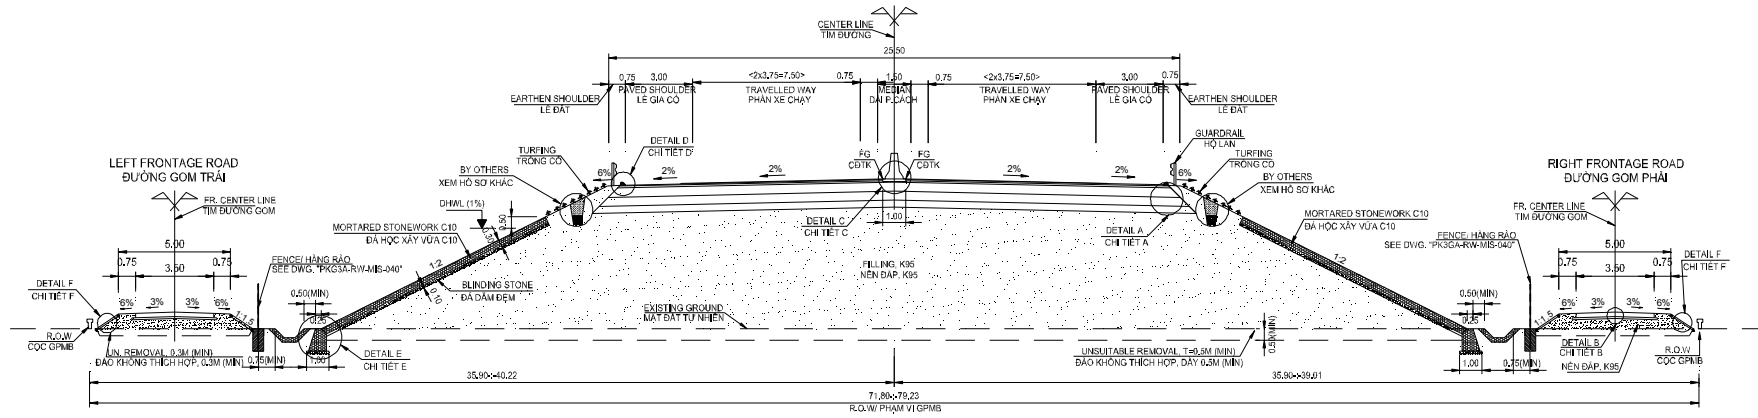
(a) Typical Cross Section of Embankment with Frontage Road (KM16+880-KM16+935.40)
